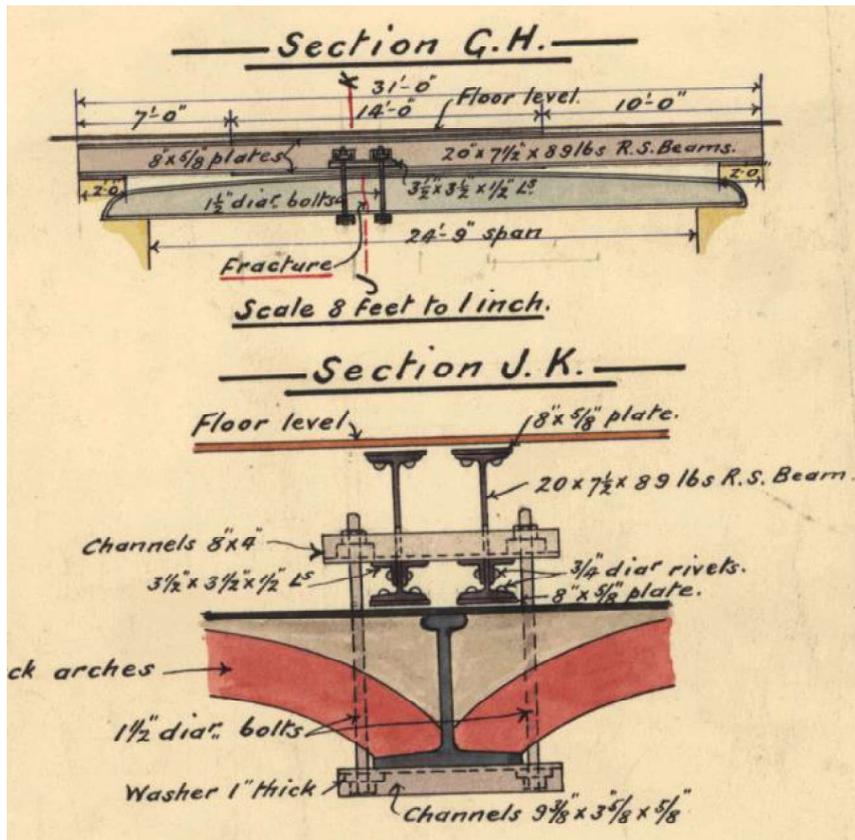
Girder 12 repair section from North London Rly. City Extension drawing (circa 1900-1920)
